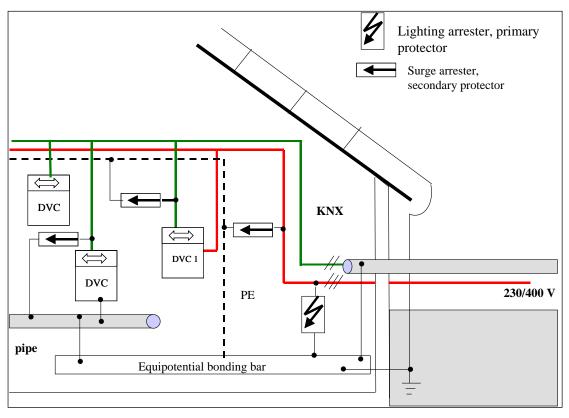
Primary and secondary protection –bus connection with other building – KNX installed in metal channels or pipes
